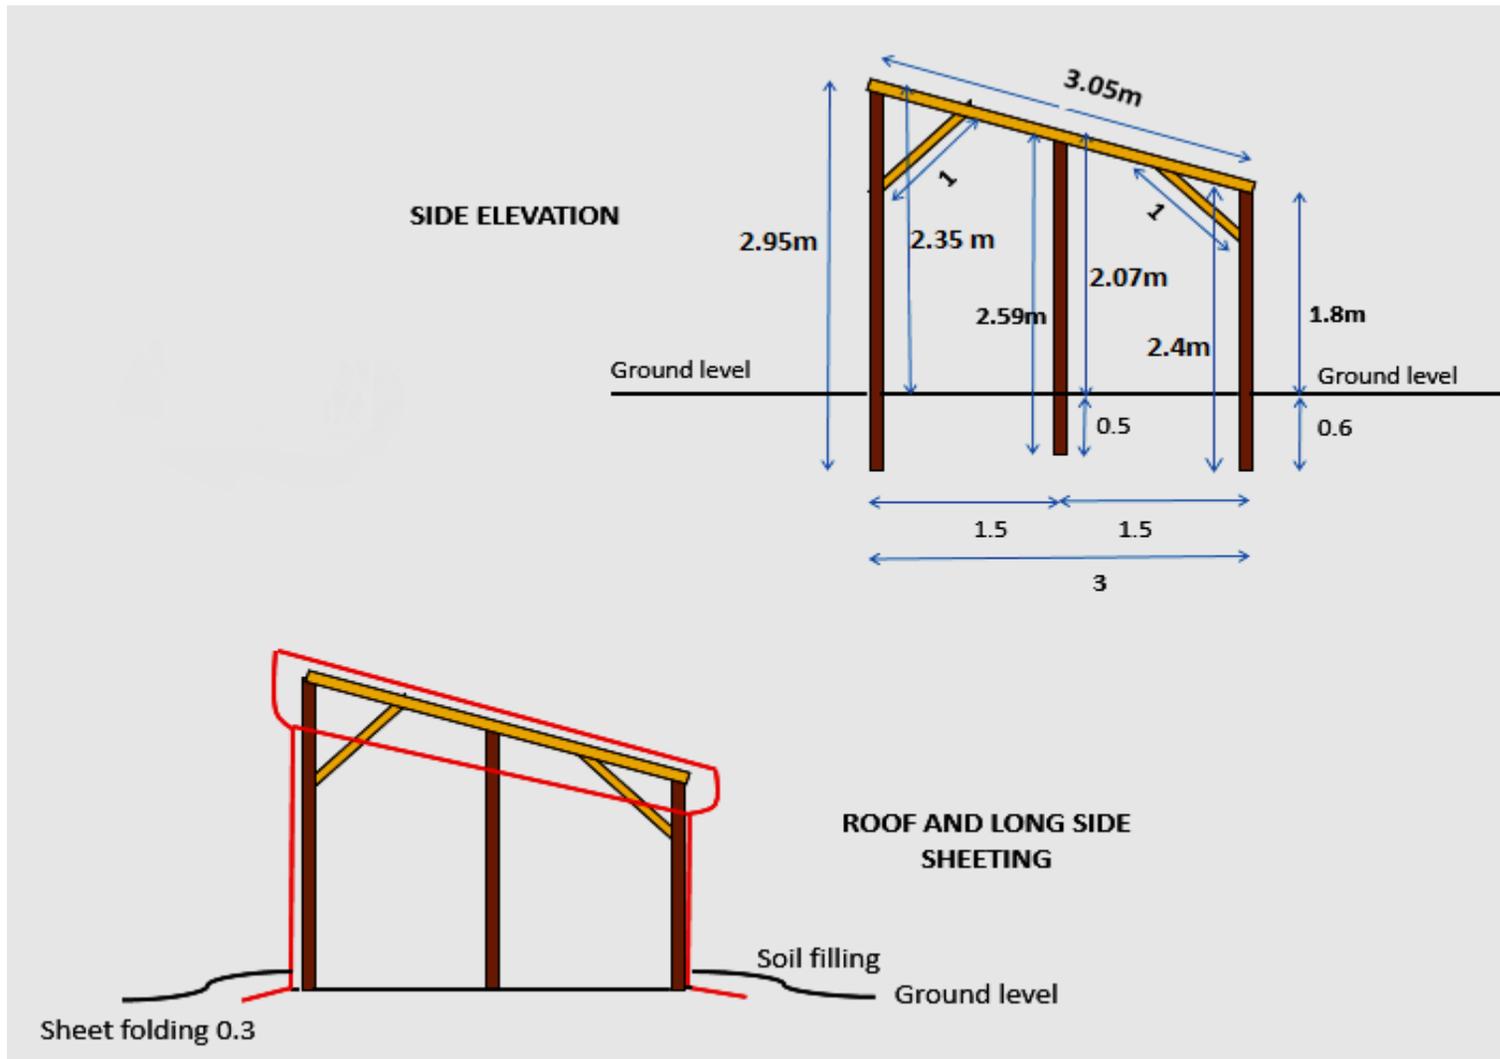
Connect the front and back sides to the 3.05m roofing timbers.
